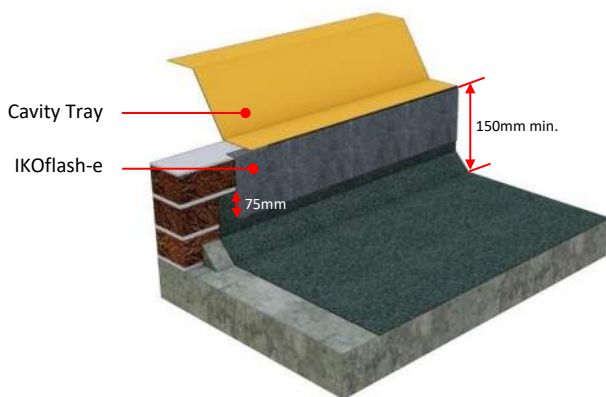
Typical interface with cavity tray on a flat roof abutment
